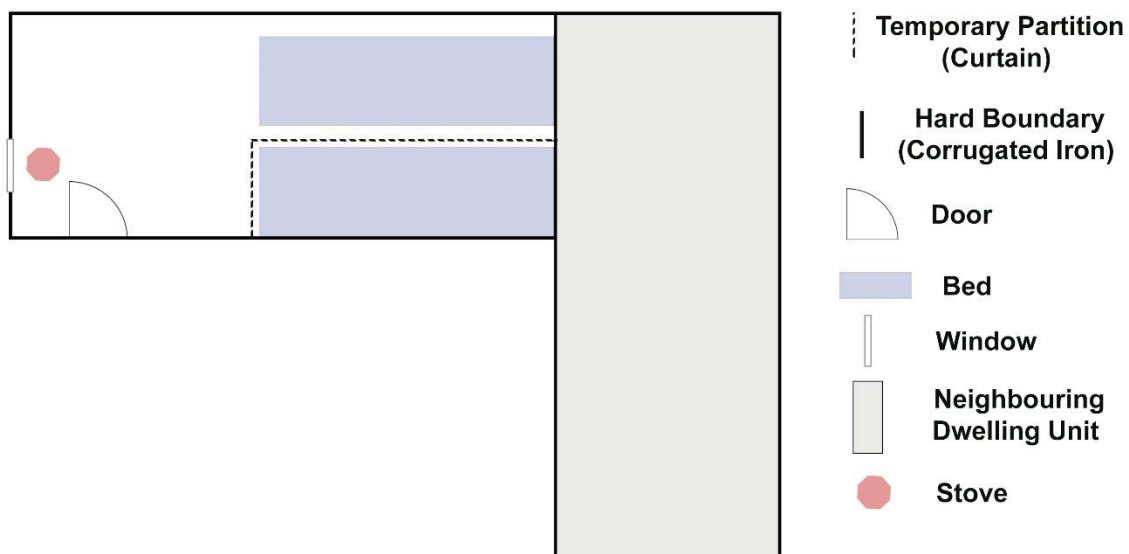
Basic floor layout of the living space at Site B. (Source: author's own image)
